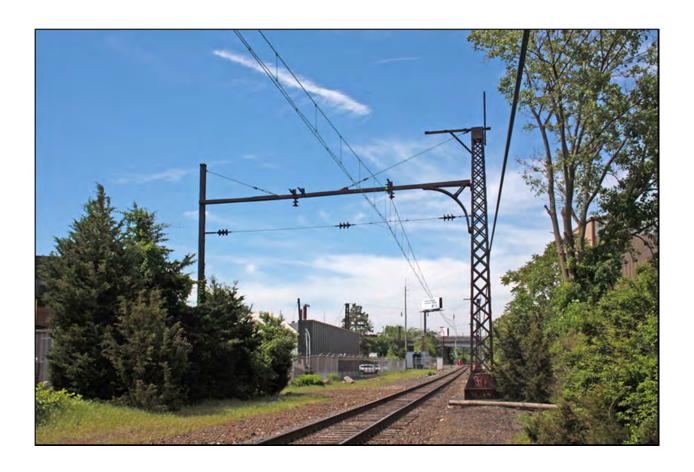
Detail of lattice pole, paired lattice-pole type, camera facing southwest.
